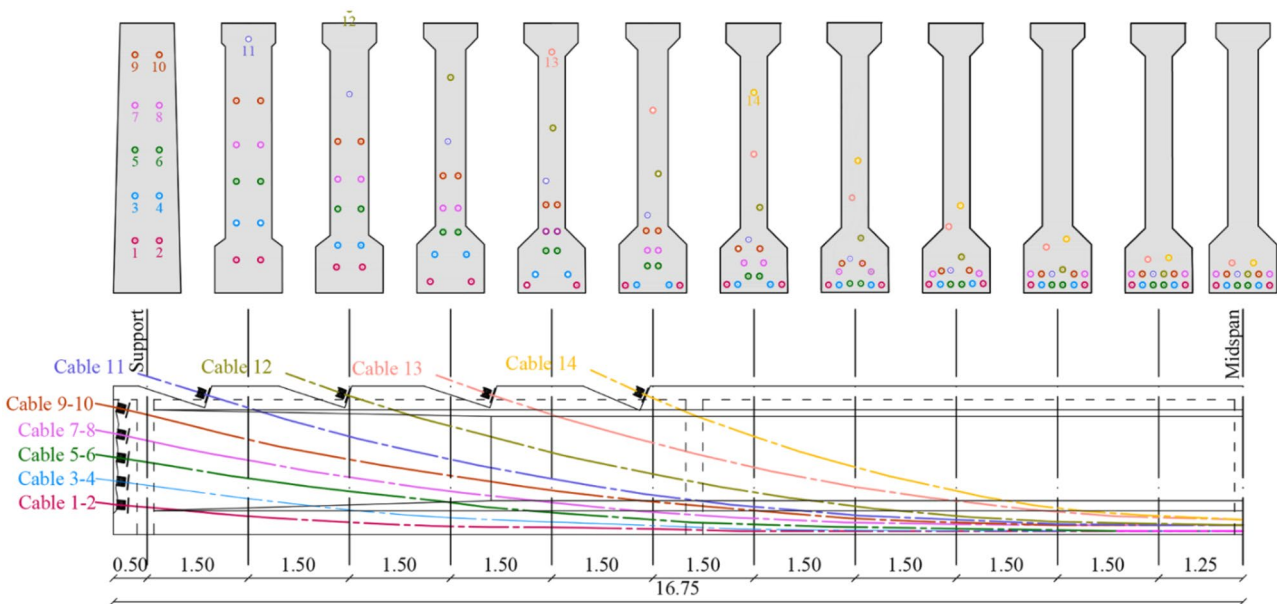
Longitudinal and transversal section of girders with post-tensioned cables
